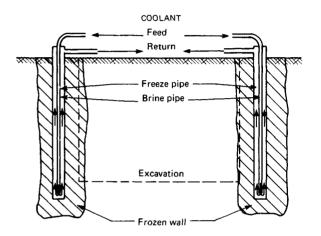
Scheme of ground freezing for support of an excavation. (After Jeffberger (1987) 'Artificial freezing of the ground for construction purposes', in: Bell (ed.) *Ground engineer's reference book.* Butterworth Scientific, Guildford)
